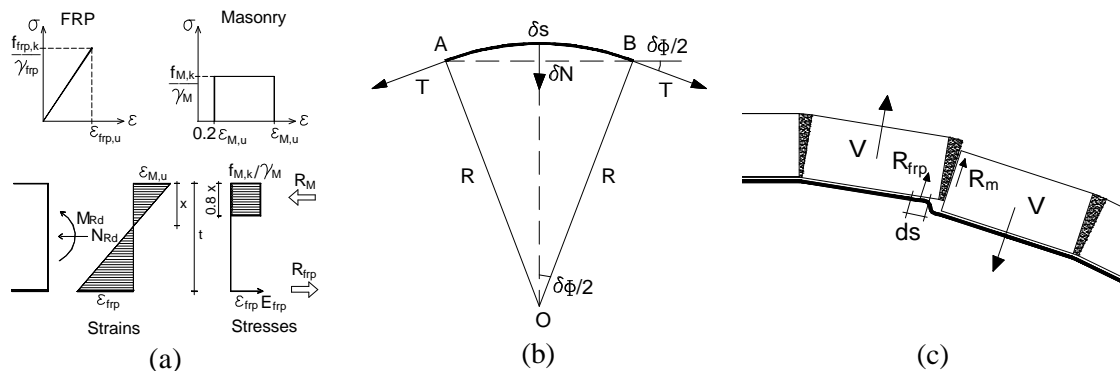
Analytical model schemes proposed for the failure mechanisms of the strengthened vaults: (a) masonry crushing, (b) detachment of the fibers, (c) shear sliding along a mortar joint.
